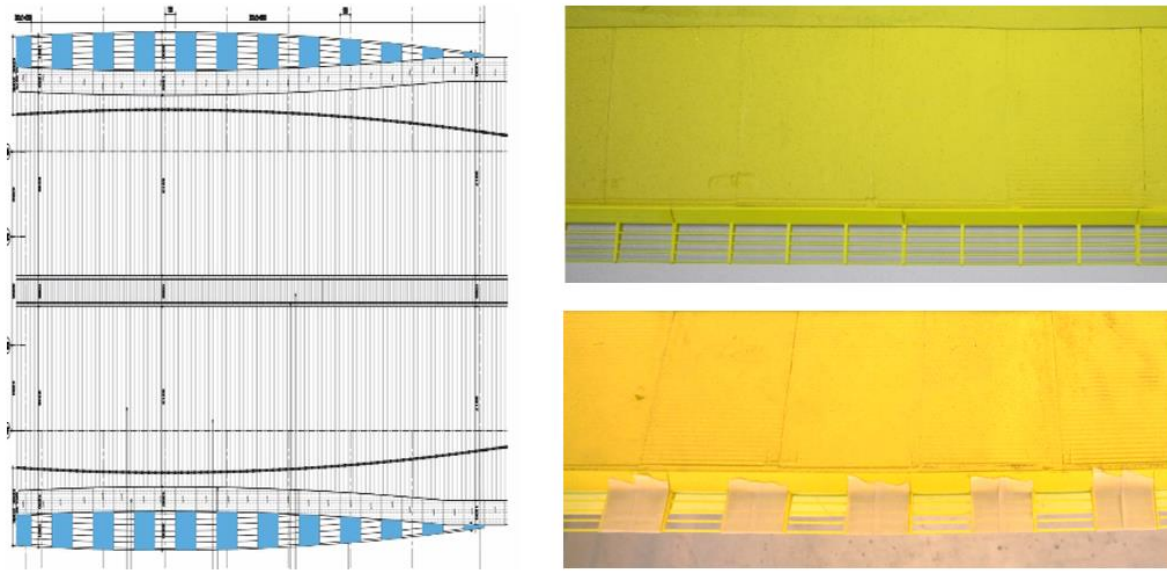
Sunshade Modification (Left) Drawing (right top) without modifications (right bottom) and with modifications (bottom)
